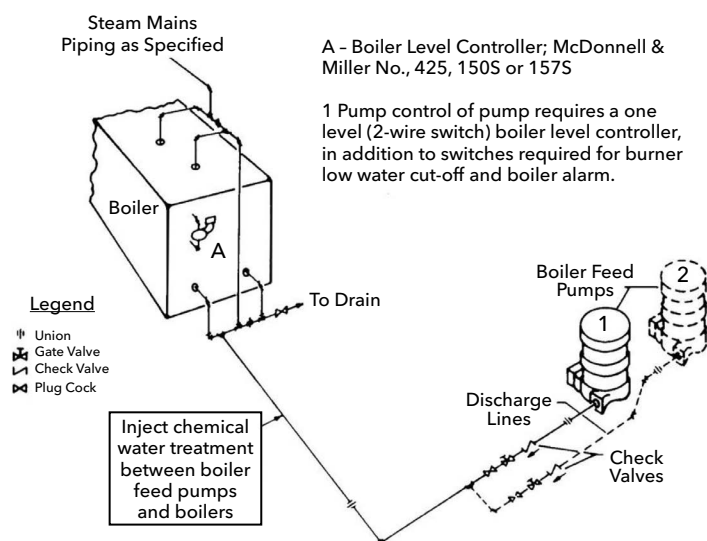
DPD21-B below shows a single boiler with one pump for feed and a second pump for standby. Pump control for this arrangement is on the boiler, and is typically a single level of actuation for turning the pump on and off. Basic electrical control panels would typically include some type of starter or contactor with thermal overload protection to start the pump motors, and two auto-off-hand selector switches to determine which pump will be used as the feed pump.
